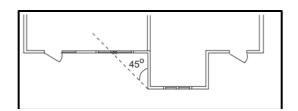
Stage 1 Plan - 45° guideline assessment. Centre of affected window is within 45° angle on the plan so stage 2 needs to be utilised.
